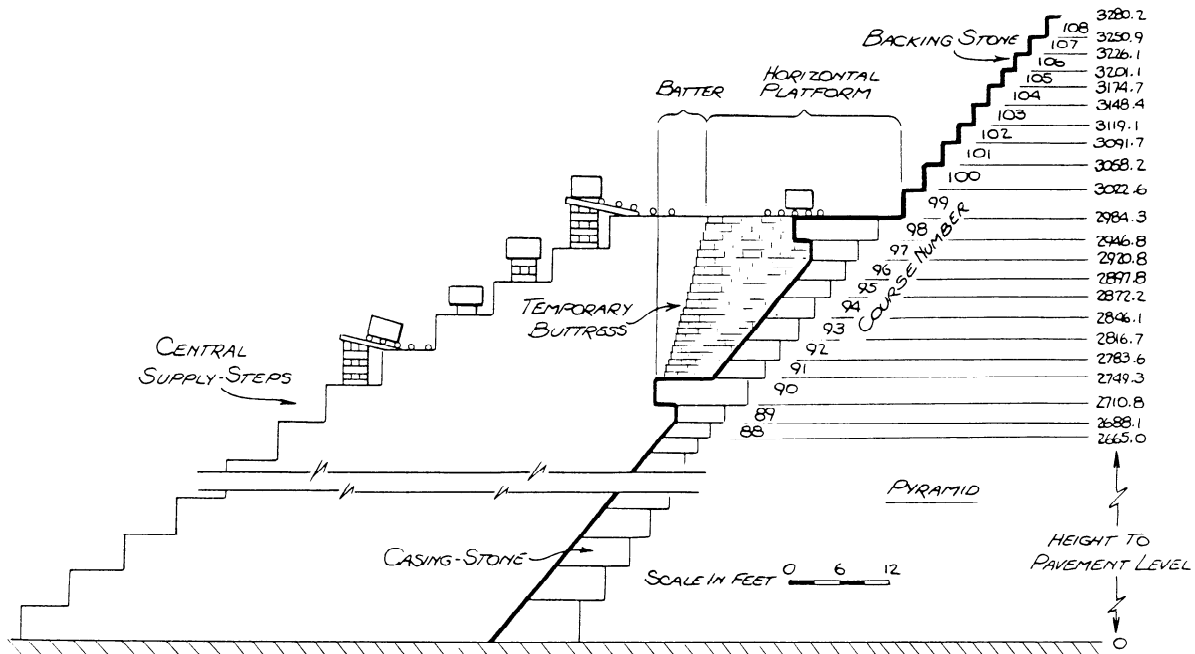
Sectional view showing size of horizontal work platform at course 98.
